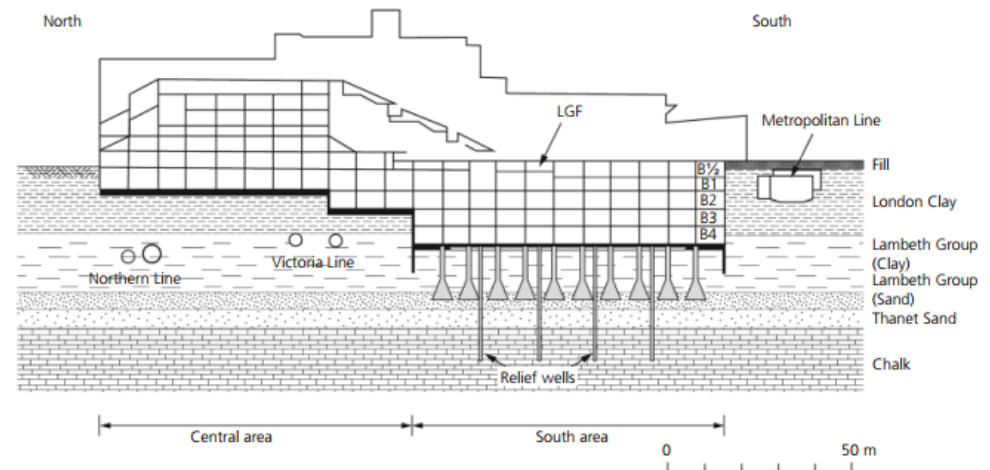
North-south section through the structure. (LGF, lower ground floor)
